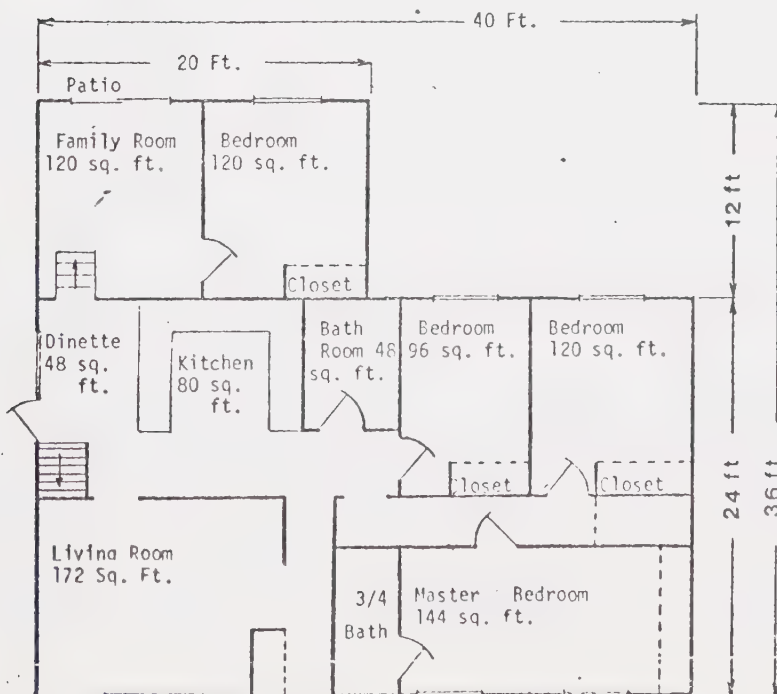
1200 square feet four bedroom floor plan including a family room (expansion two).
